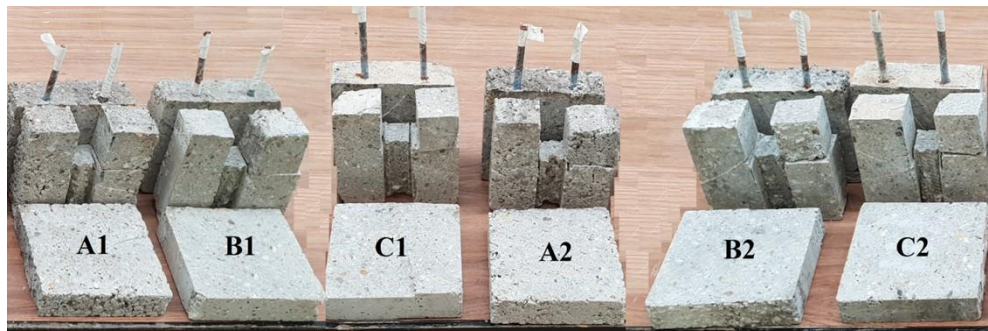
Reinforced concrete samples after cutting and removing one reinforcing steel bar from each sample.
